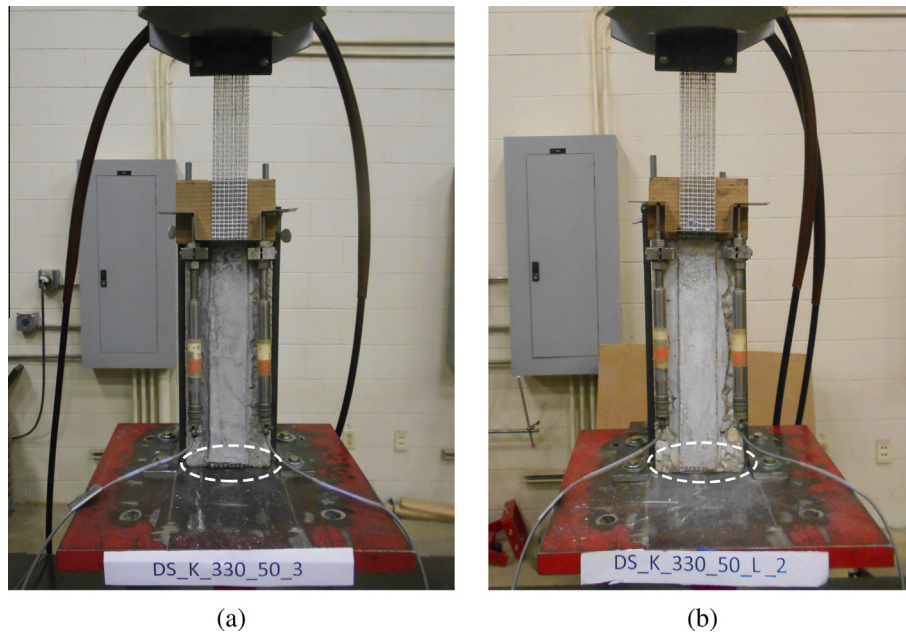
Photo of single-lap direct-shear test (a) specimen with external matrix layer (specimen DS_K_330_50_3 shown) and (b) specimen with the external matrix layer omitted (specimen DS_K_330_50_L_2 shown). Note the fibers extending beyond the bonded area at the free end (circled in the photographs).
